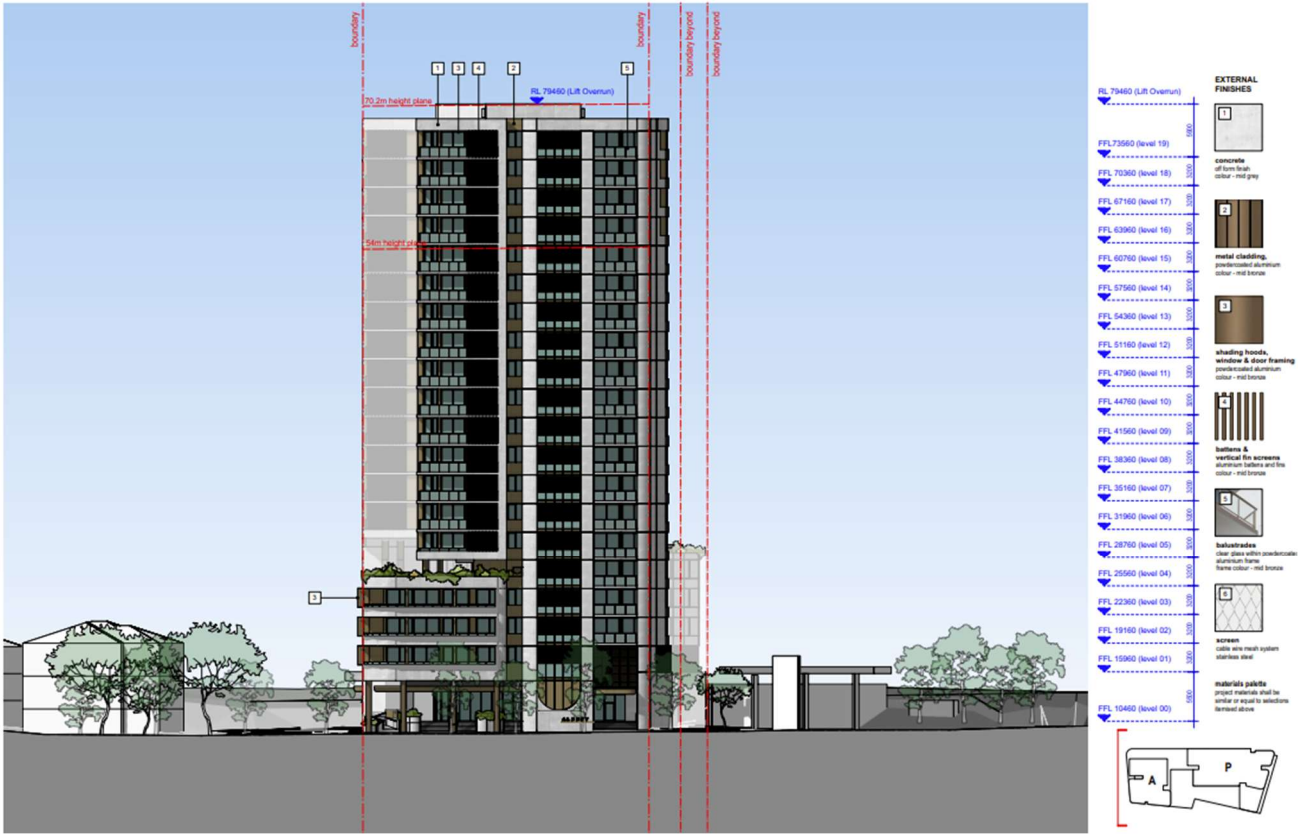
Extract of the proposed southwest elevation to Albert Road.
